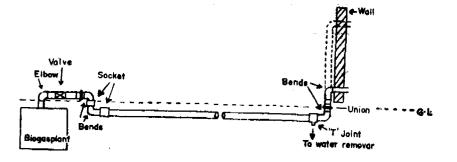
Sketch of sample layout of pipeline from biogas plant to the house
